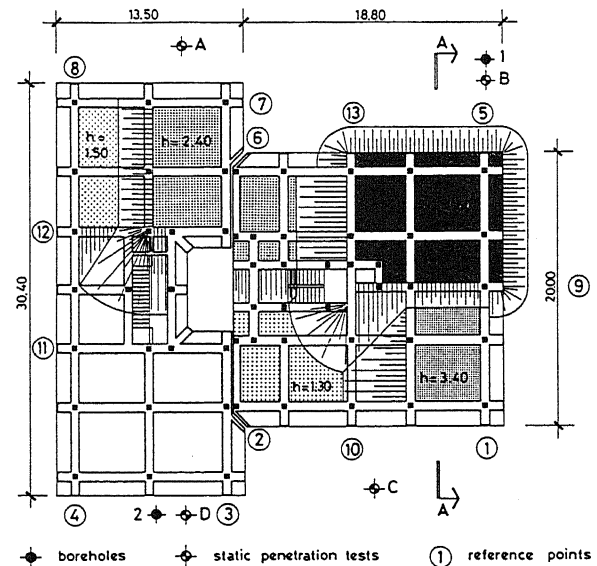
Lay-out of the Foundation Mat with the Height (h) of Sand Loading and Reference Points
